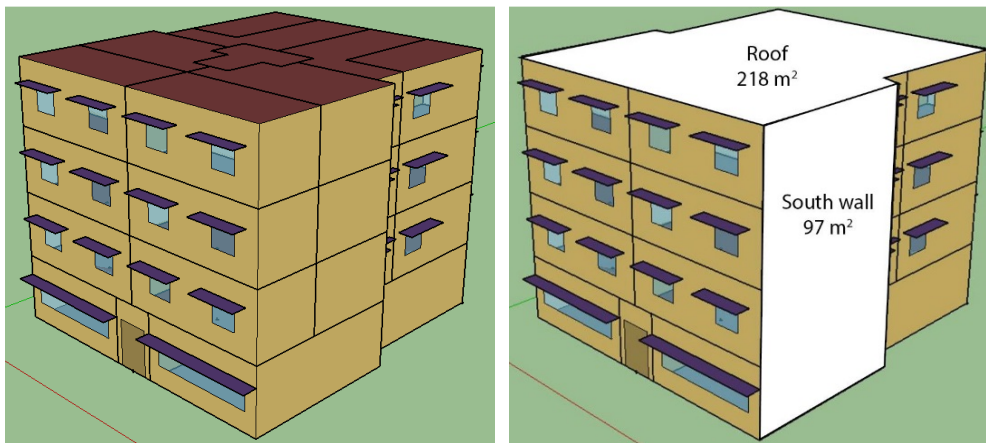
Building schematic (left) and roof and wall areas available for PV coverage (right)
